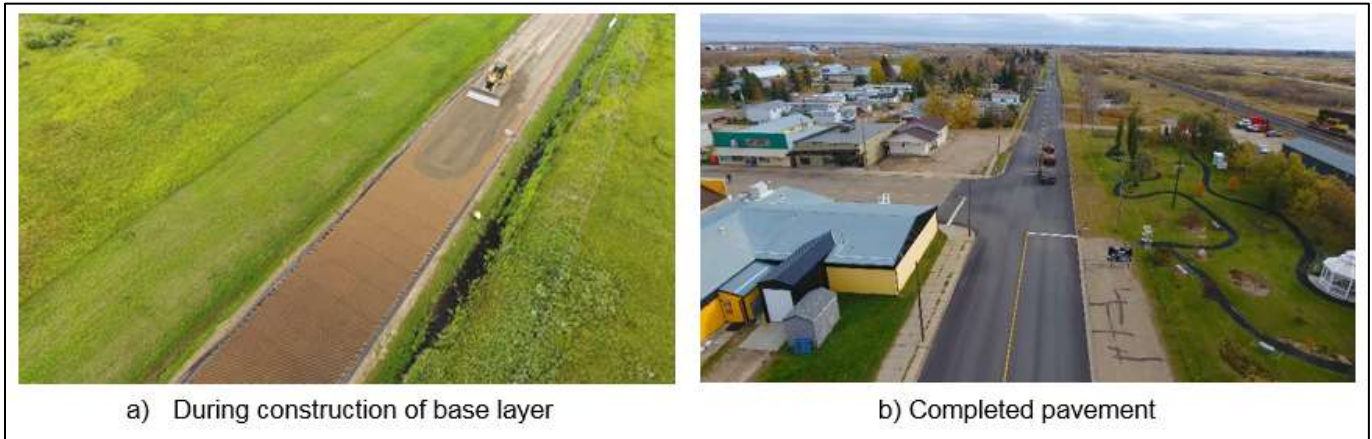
50 Avenue a) during construction of base layer b) completed pavement
